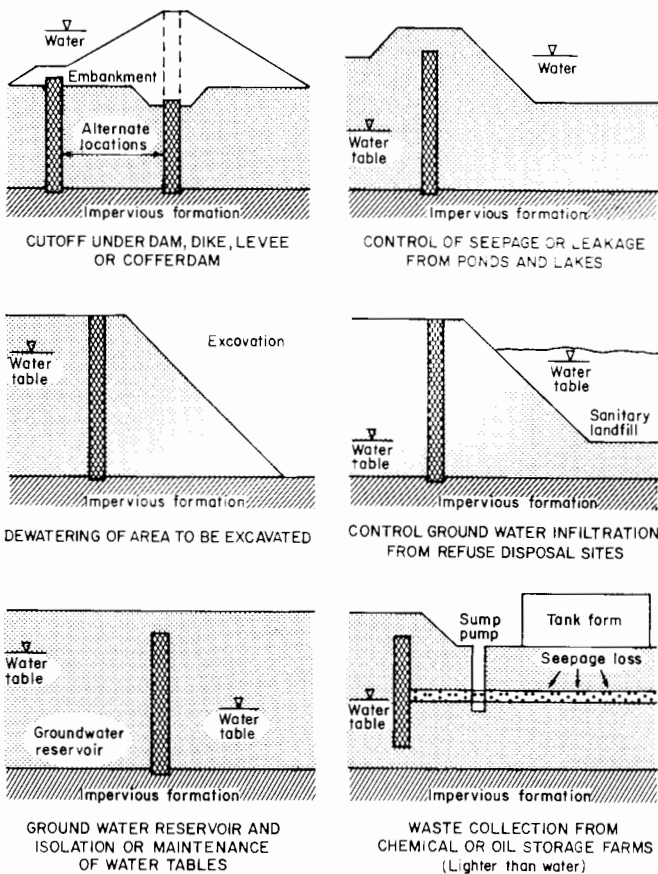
Typical applications for slurry trench cutoff walls. (From Millet and Perez²)
